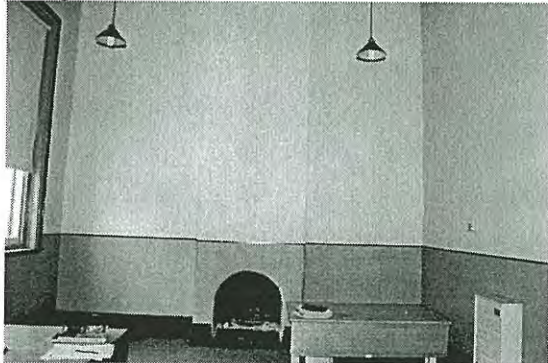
Interior, Office (spaces FF04-05). View looking north showing original (altered) round arched fireplace.
